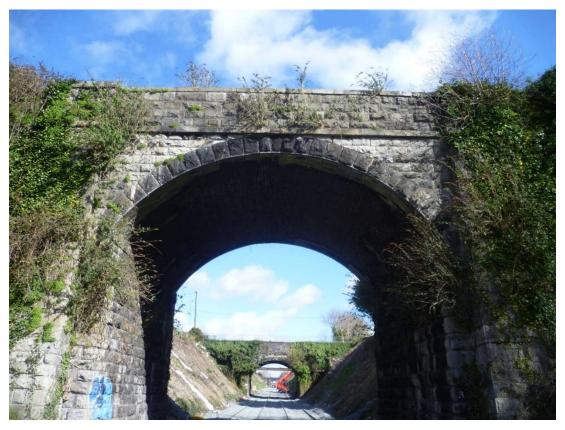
McKee Barracks Bridge (OBO3) south elevation
